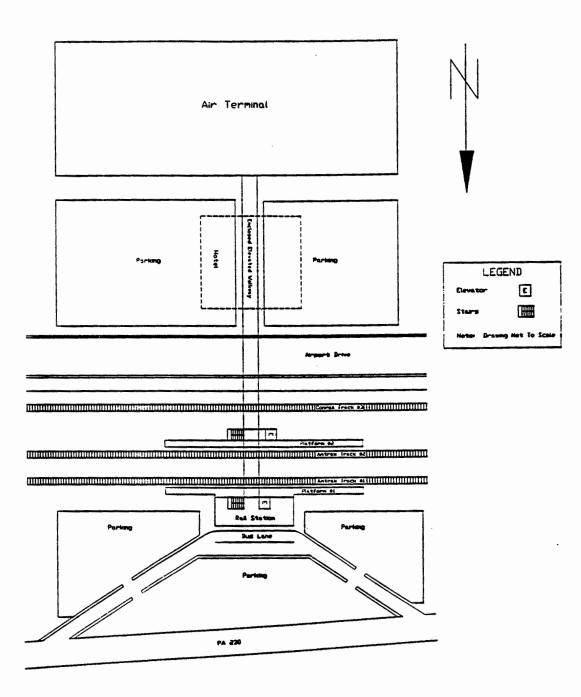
A: Two Platforms with Overhead Walkway- Plan View
